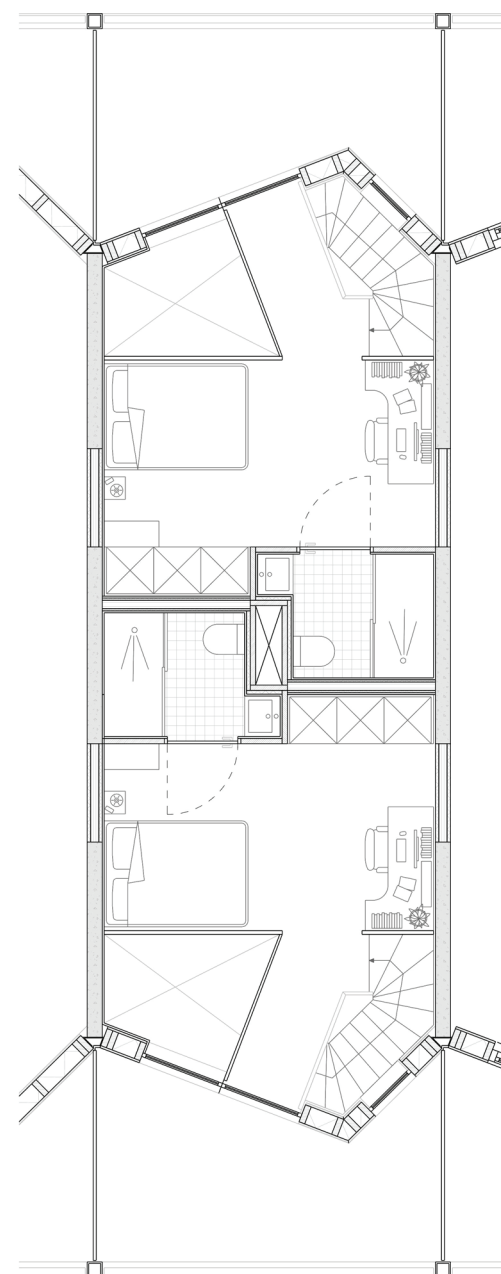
Mezzanine apartment first floor, 1:100. Drawing by author
